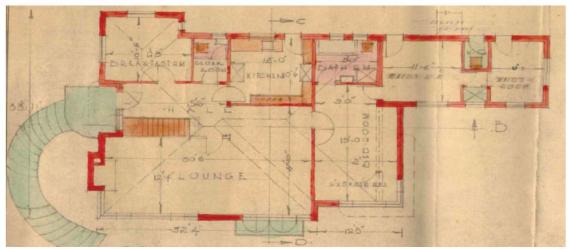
Original ground floor plan, c. 1938 Source: Woollahra Council
